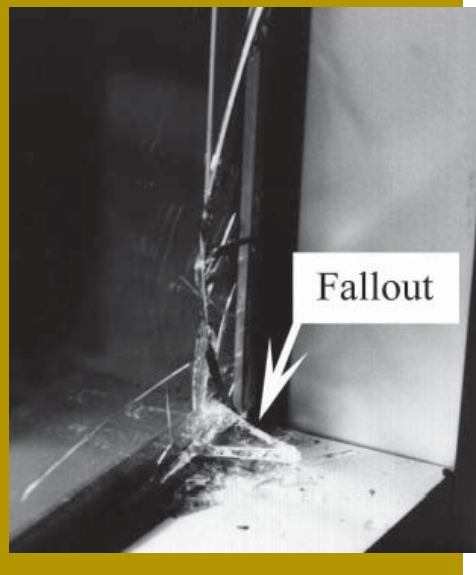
Examples of Spalling and Cracking (Serviceability Issue) and Fallout (Safety Issue) Failure in Annealed Architectural Glass Panels
